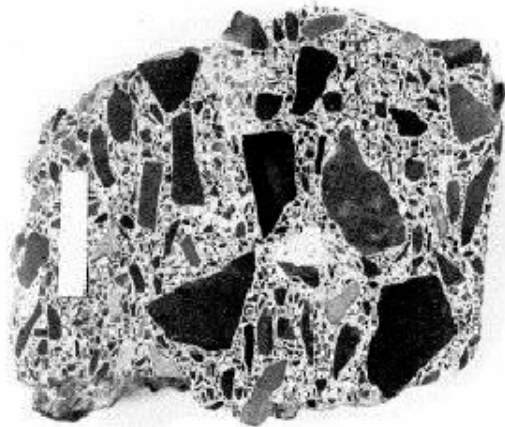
A. Polished Cross-section of Construction-grade Concrete From a Section of K-25 Flooring
